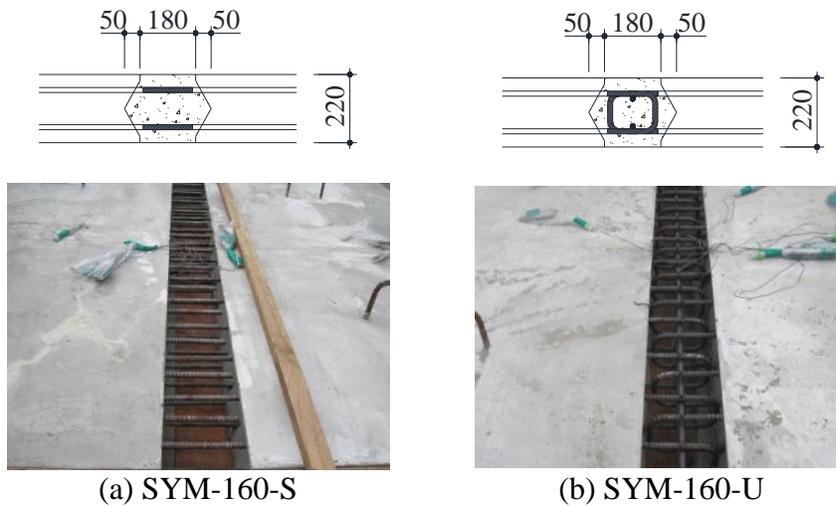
Geometry of the precast deck joint and bar details (Note: 1 in. = 25.4 mm)
